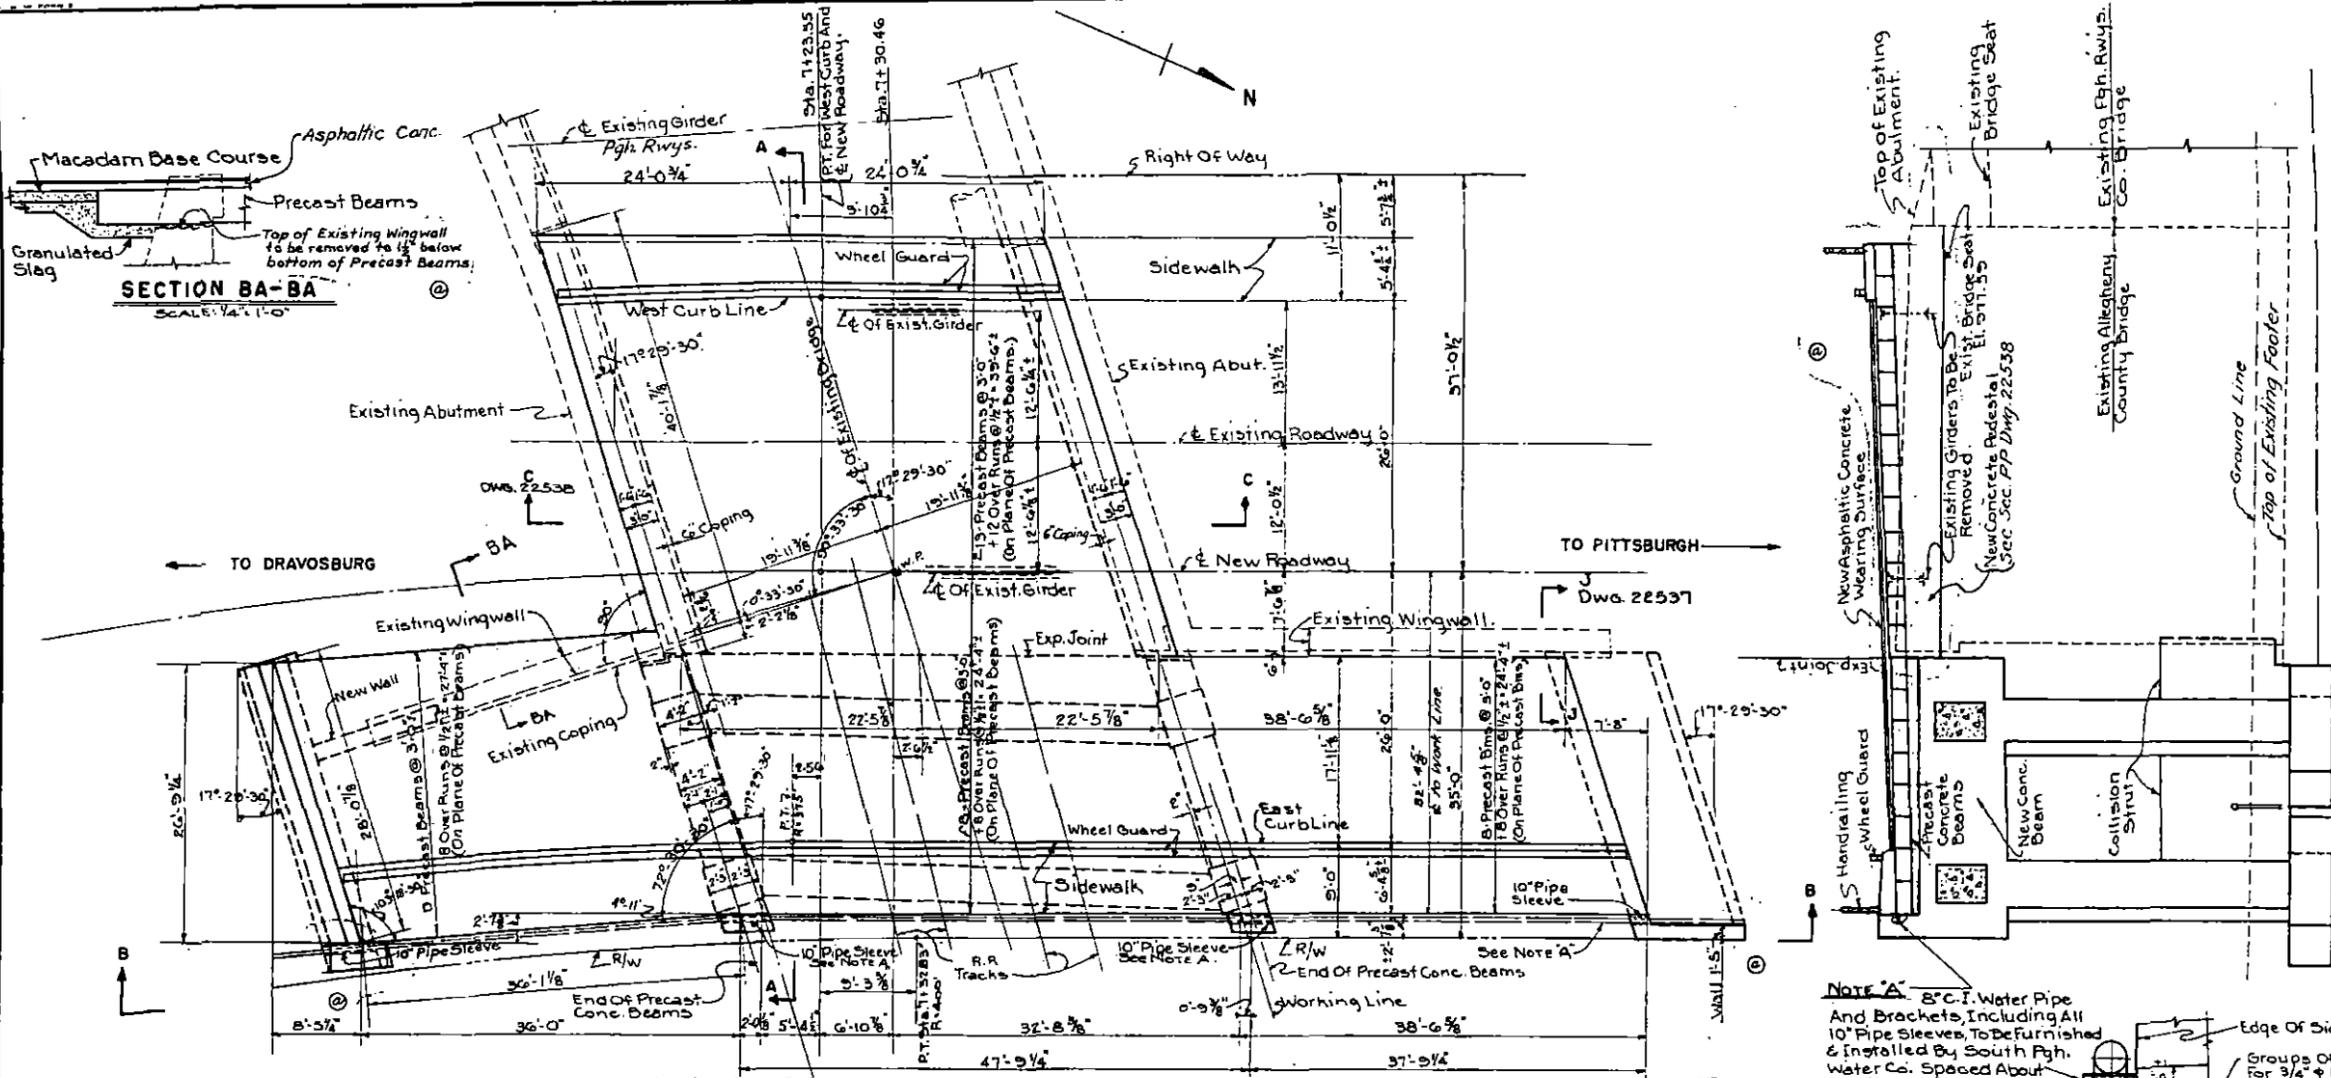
Exhibit B – Existing Bridge General Plan, Elevation and Typical Section
